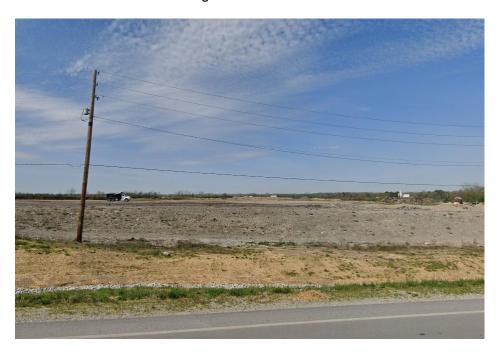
Mining Operation to North Viewed from Belmont (April 2025)
